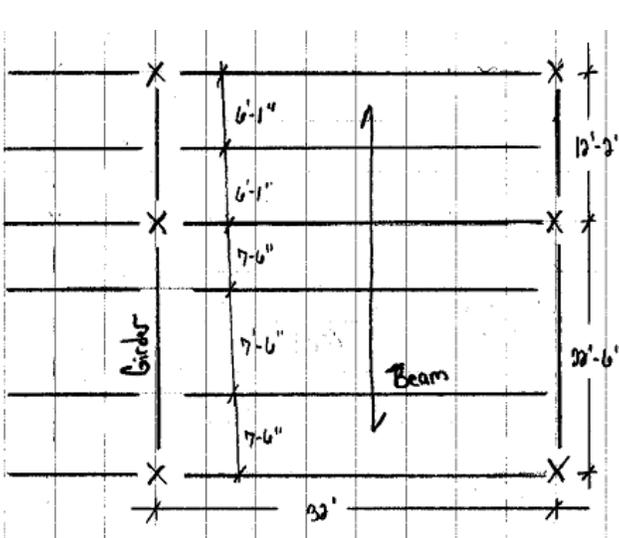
Plan used for Composite Steel design (identical column grid used for Hollow-core Plank design)
